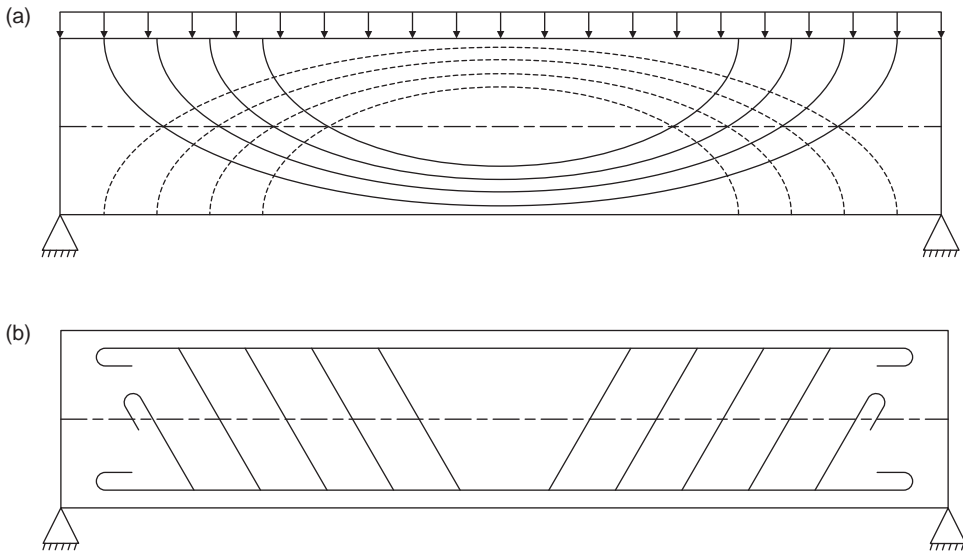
Reinforced concrete beams: (a) principal stress trajectories; (b) layout of steels.
